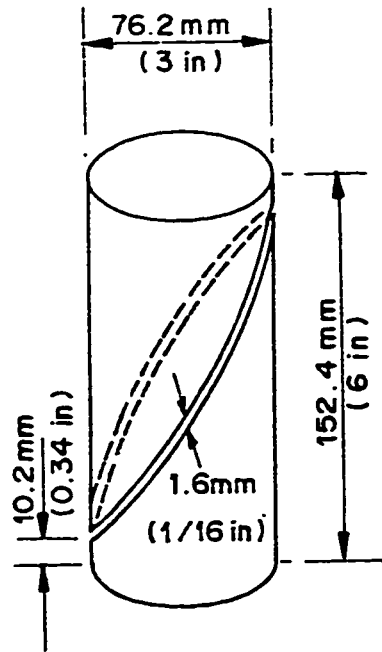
Concrete Cylindrical Specimen for Epoxy Injection
